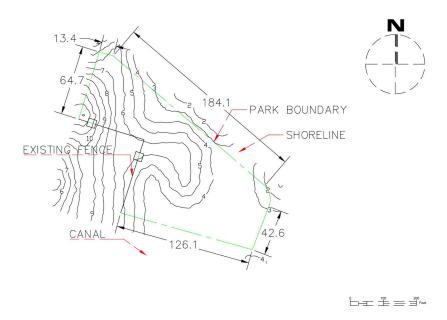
This image shows the preconstruction details of the lot in Civil3D. The plan shows elevation data, the existing sea wall and canals, and where a fence was placed between the lot and the water pump station.
